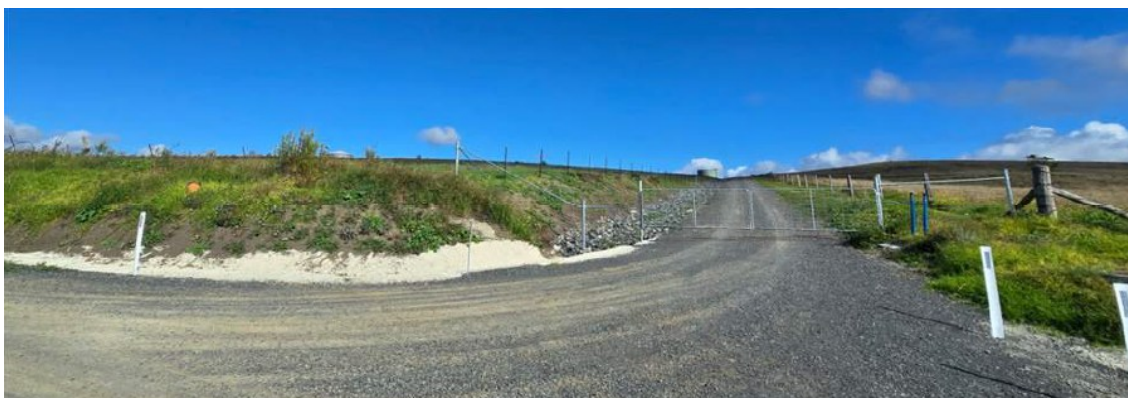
View of new access and reservoir from Madsens Road (looking west)
